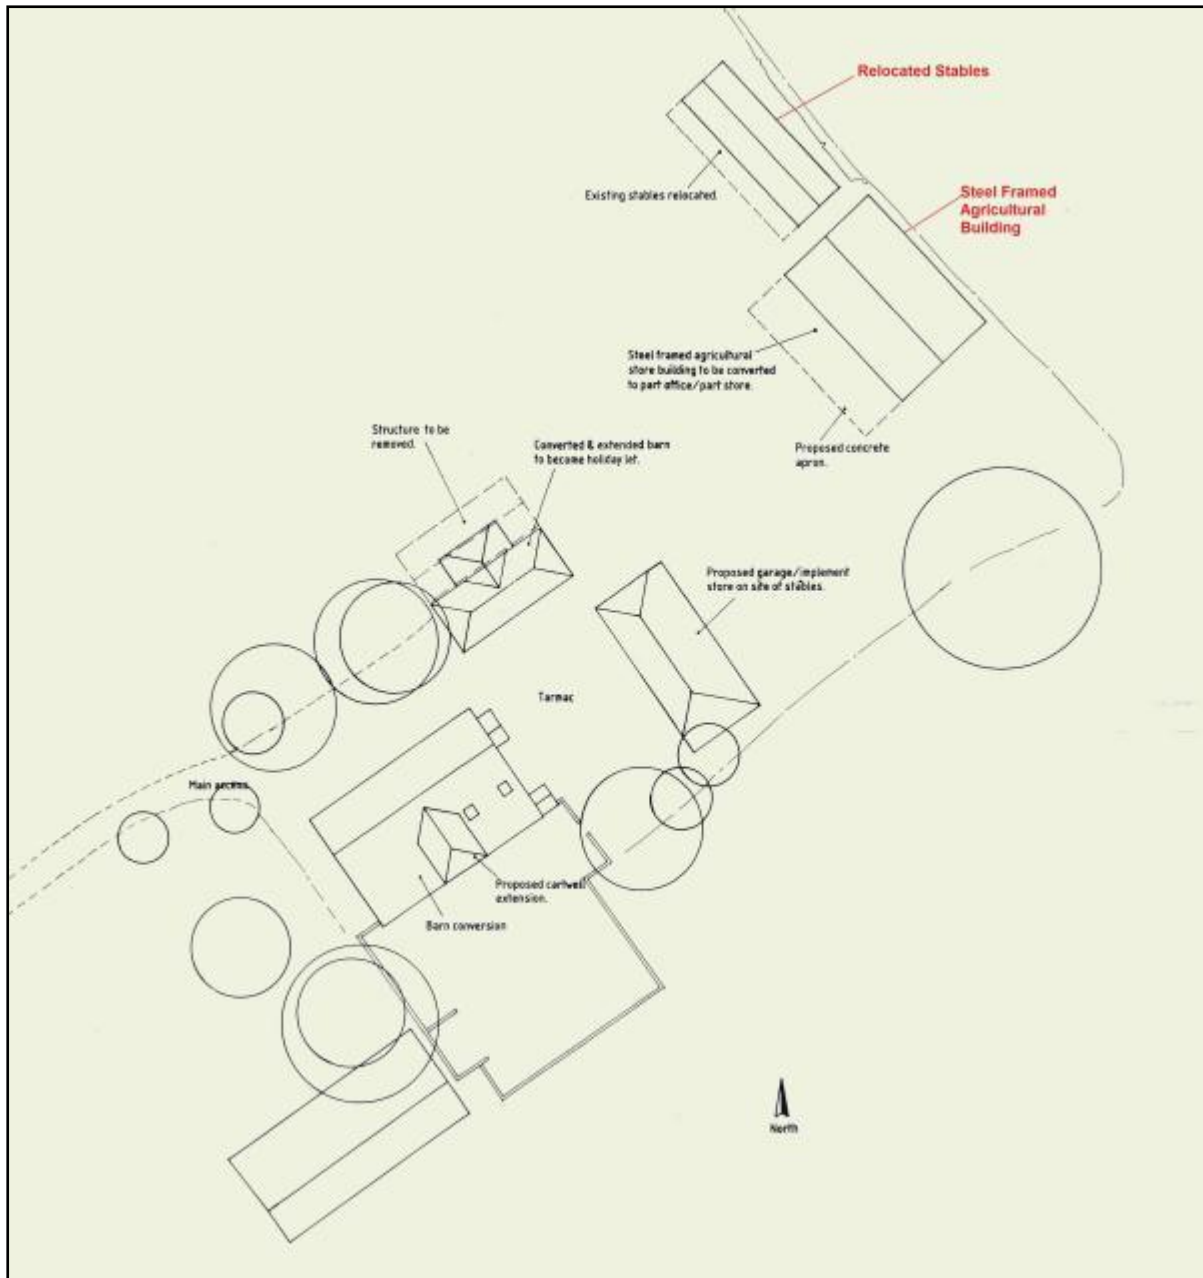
Methersham Farm, Beckley: site plan showing buildings affected (adapted from architects plan)
